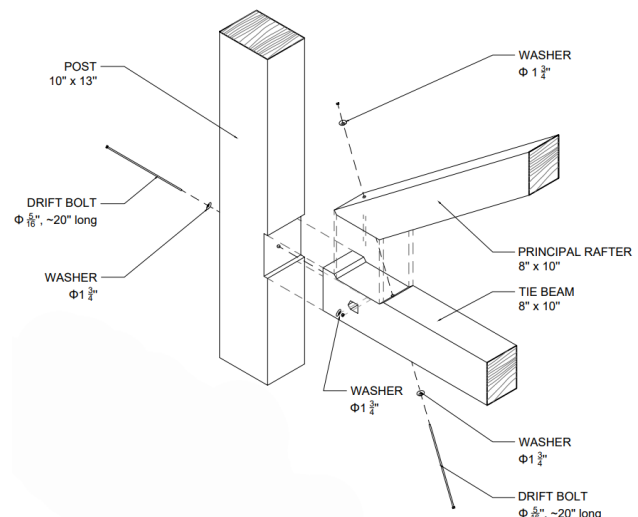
Reverse engineered timber joint drawn by Daniela Castro
